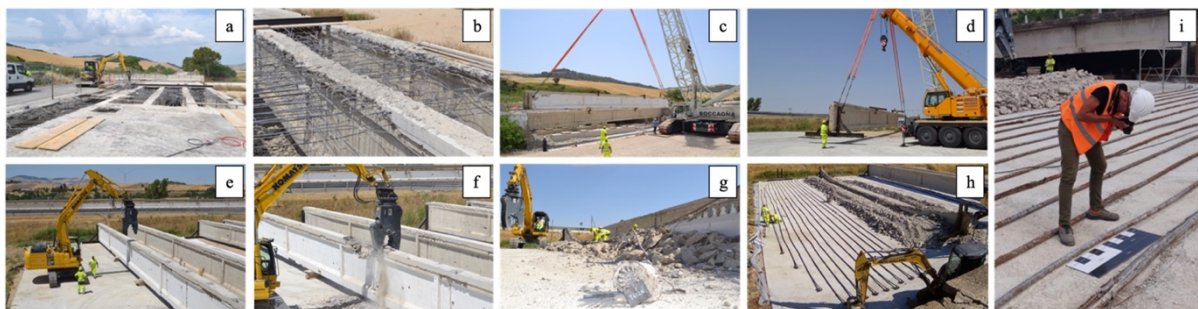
a) demolition of the concrete slab; (b) demolition of the 5 cross-girders; (c) movement of the girders; (d) positioning of the girders on the ground; (e) excavator with the hydraulic crusher pliers; (f) demolition of the girders; (g)
